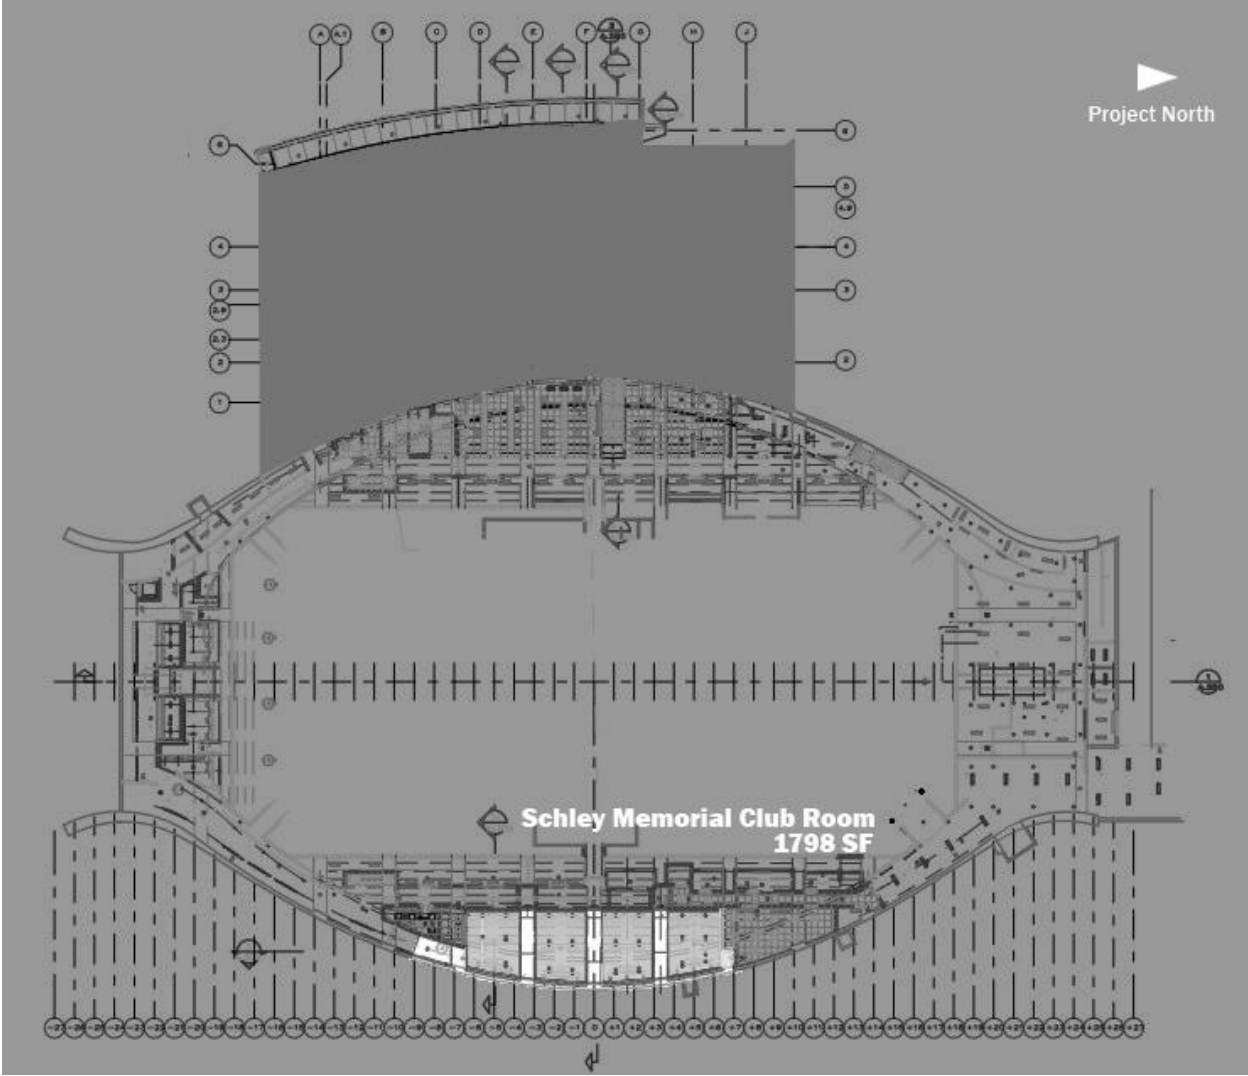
| Basement Floor Plan – Schley Memorial Club Rom
